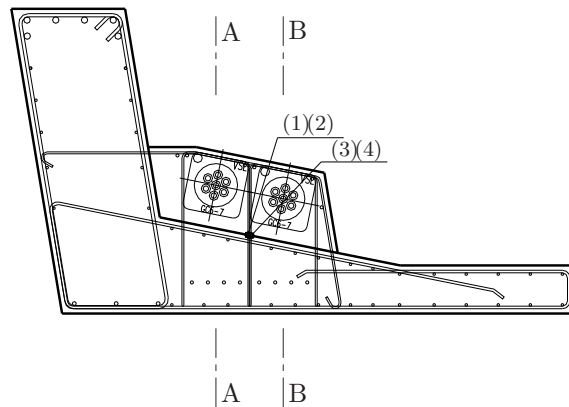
Strain gauges on the anchorage blister reinforcement (Section C-C)
